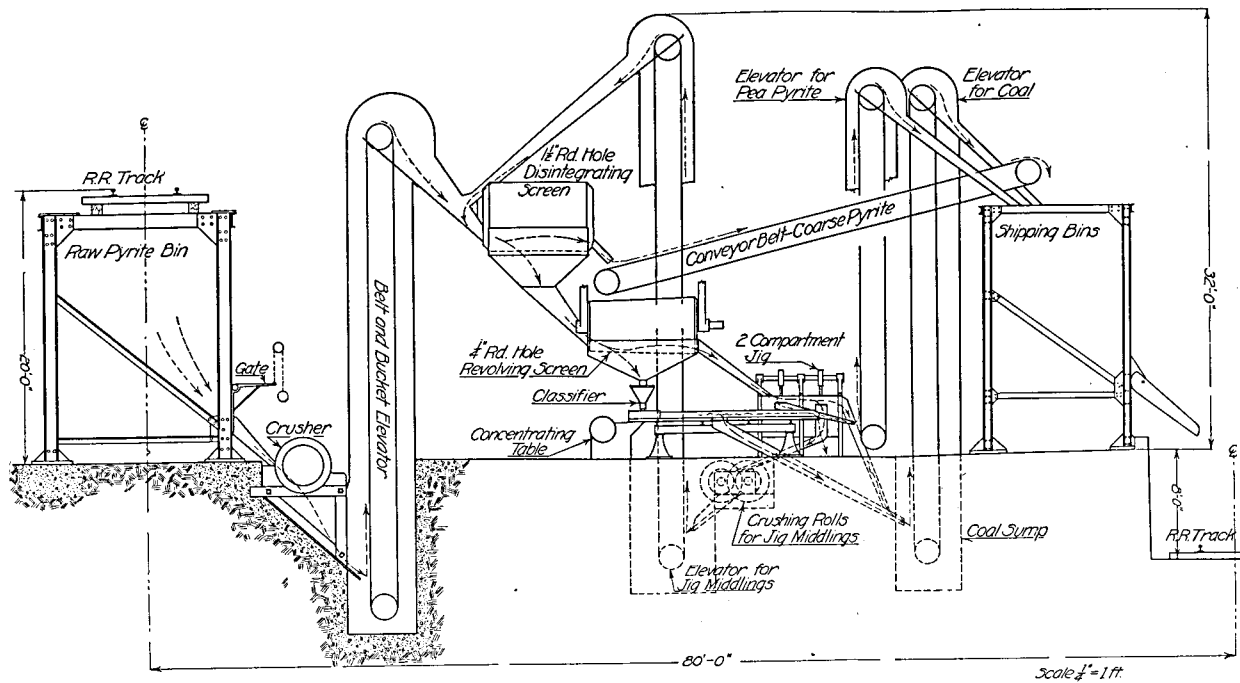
SIDE ELEVATION OF PROPOSED PYRITE WASHING PLANT
